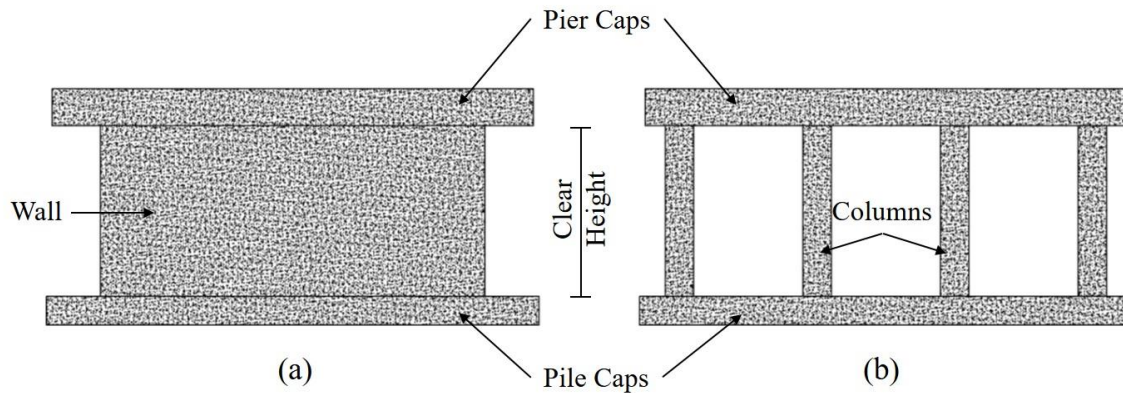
Two of the most common pier types used in Illinois: (a) wall pier; (b) multi-column pier.
